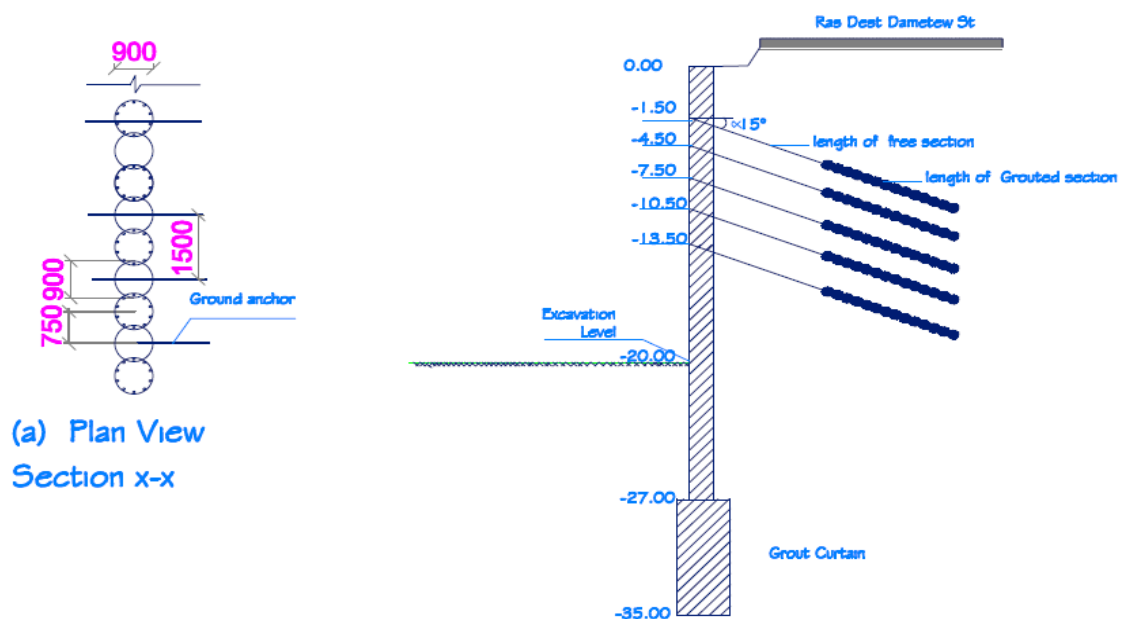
Cross section of the secant pile wall as the alternative scheme [5]
